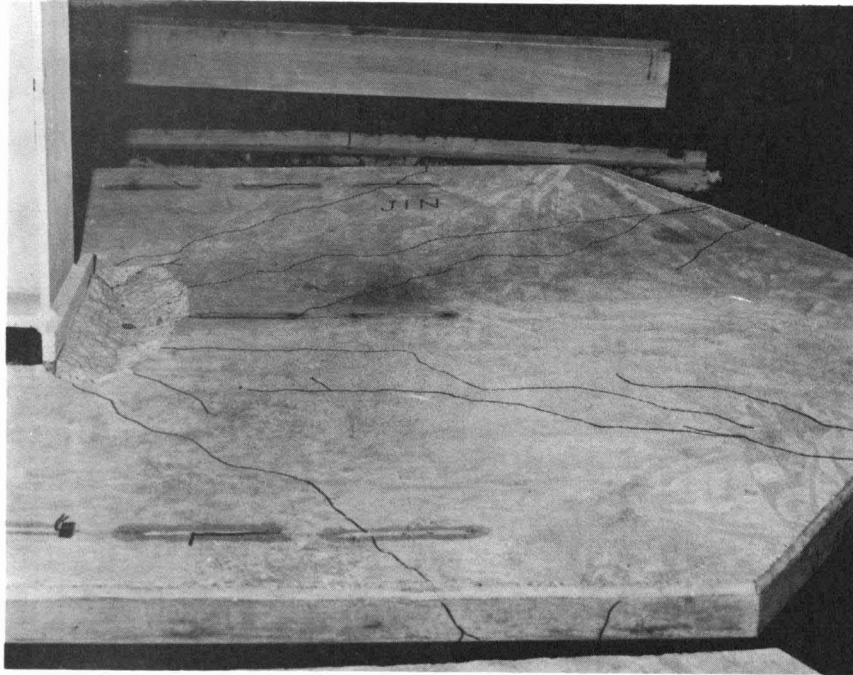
Cracking of Slabs and Crushing of Concrete at Face of Column
